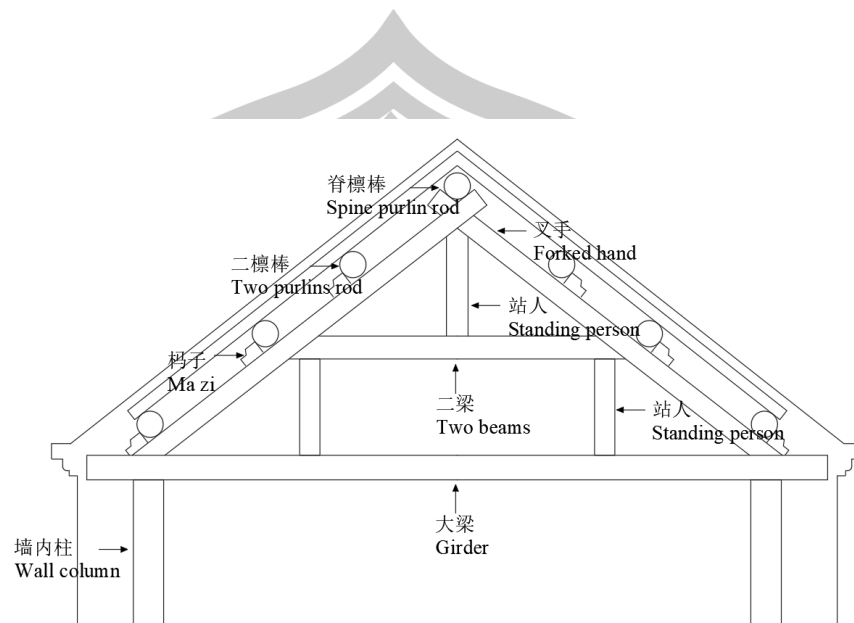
A unique structure of ancient Xuzhou houses : Heavy Beam Hanger
